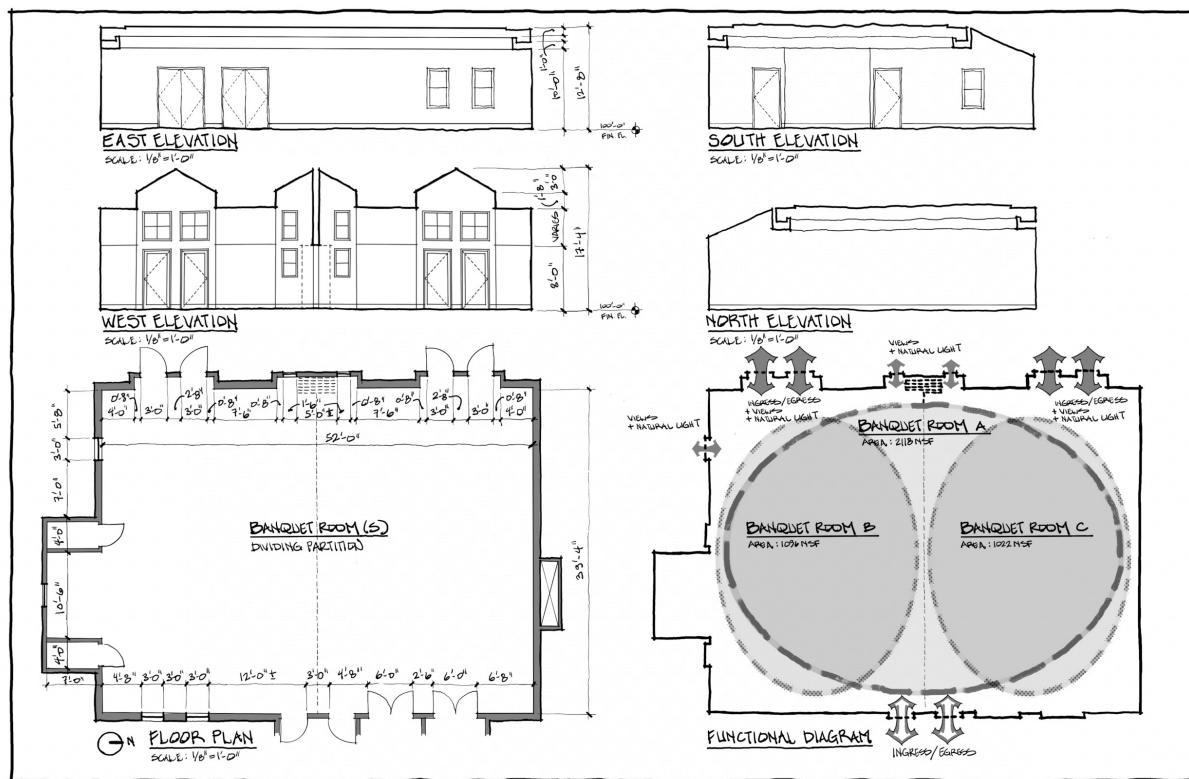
Exercise Seven: Interior Construction Drawing. Floor Plan and Interior Elevations
